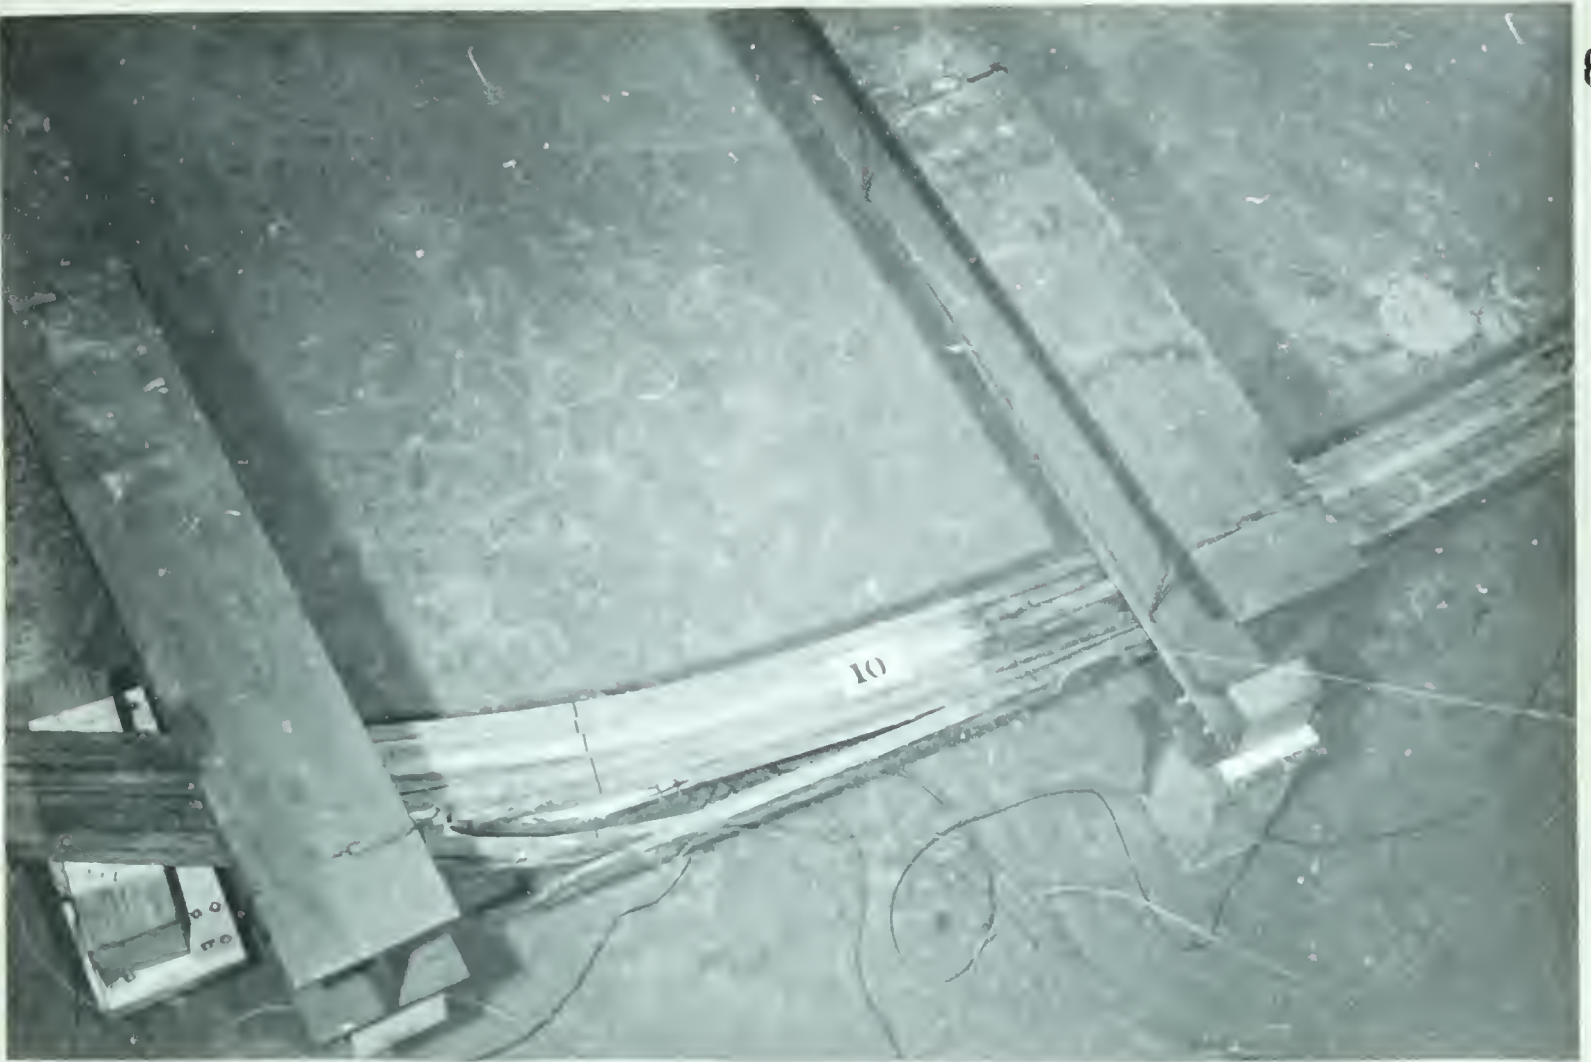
View of Failure in Arch Specimen No. 10.
